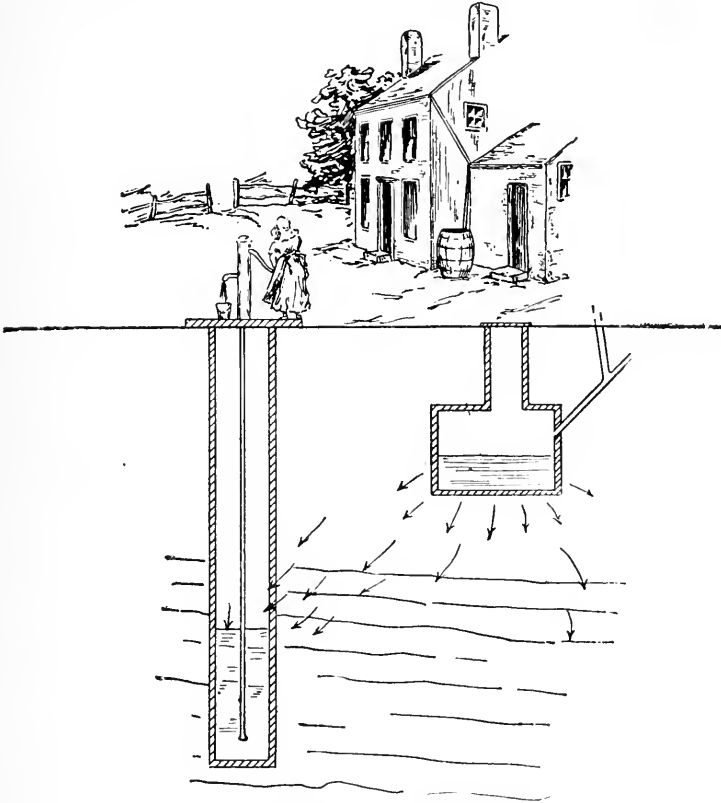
WELL, CONTAMINATED BY HOUSE DRAINAGE.
